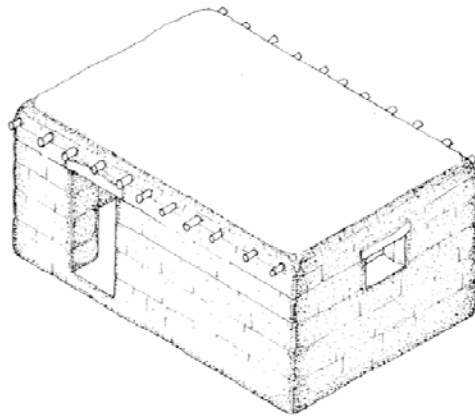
Sketch of Flat-Roof Buildings²⁹⁵
